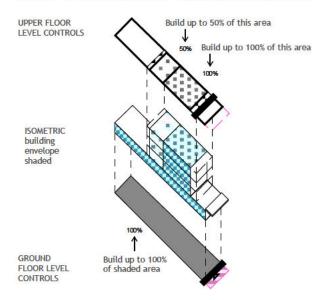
Building envelope - Potential architectural resolution within a building envelope
